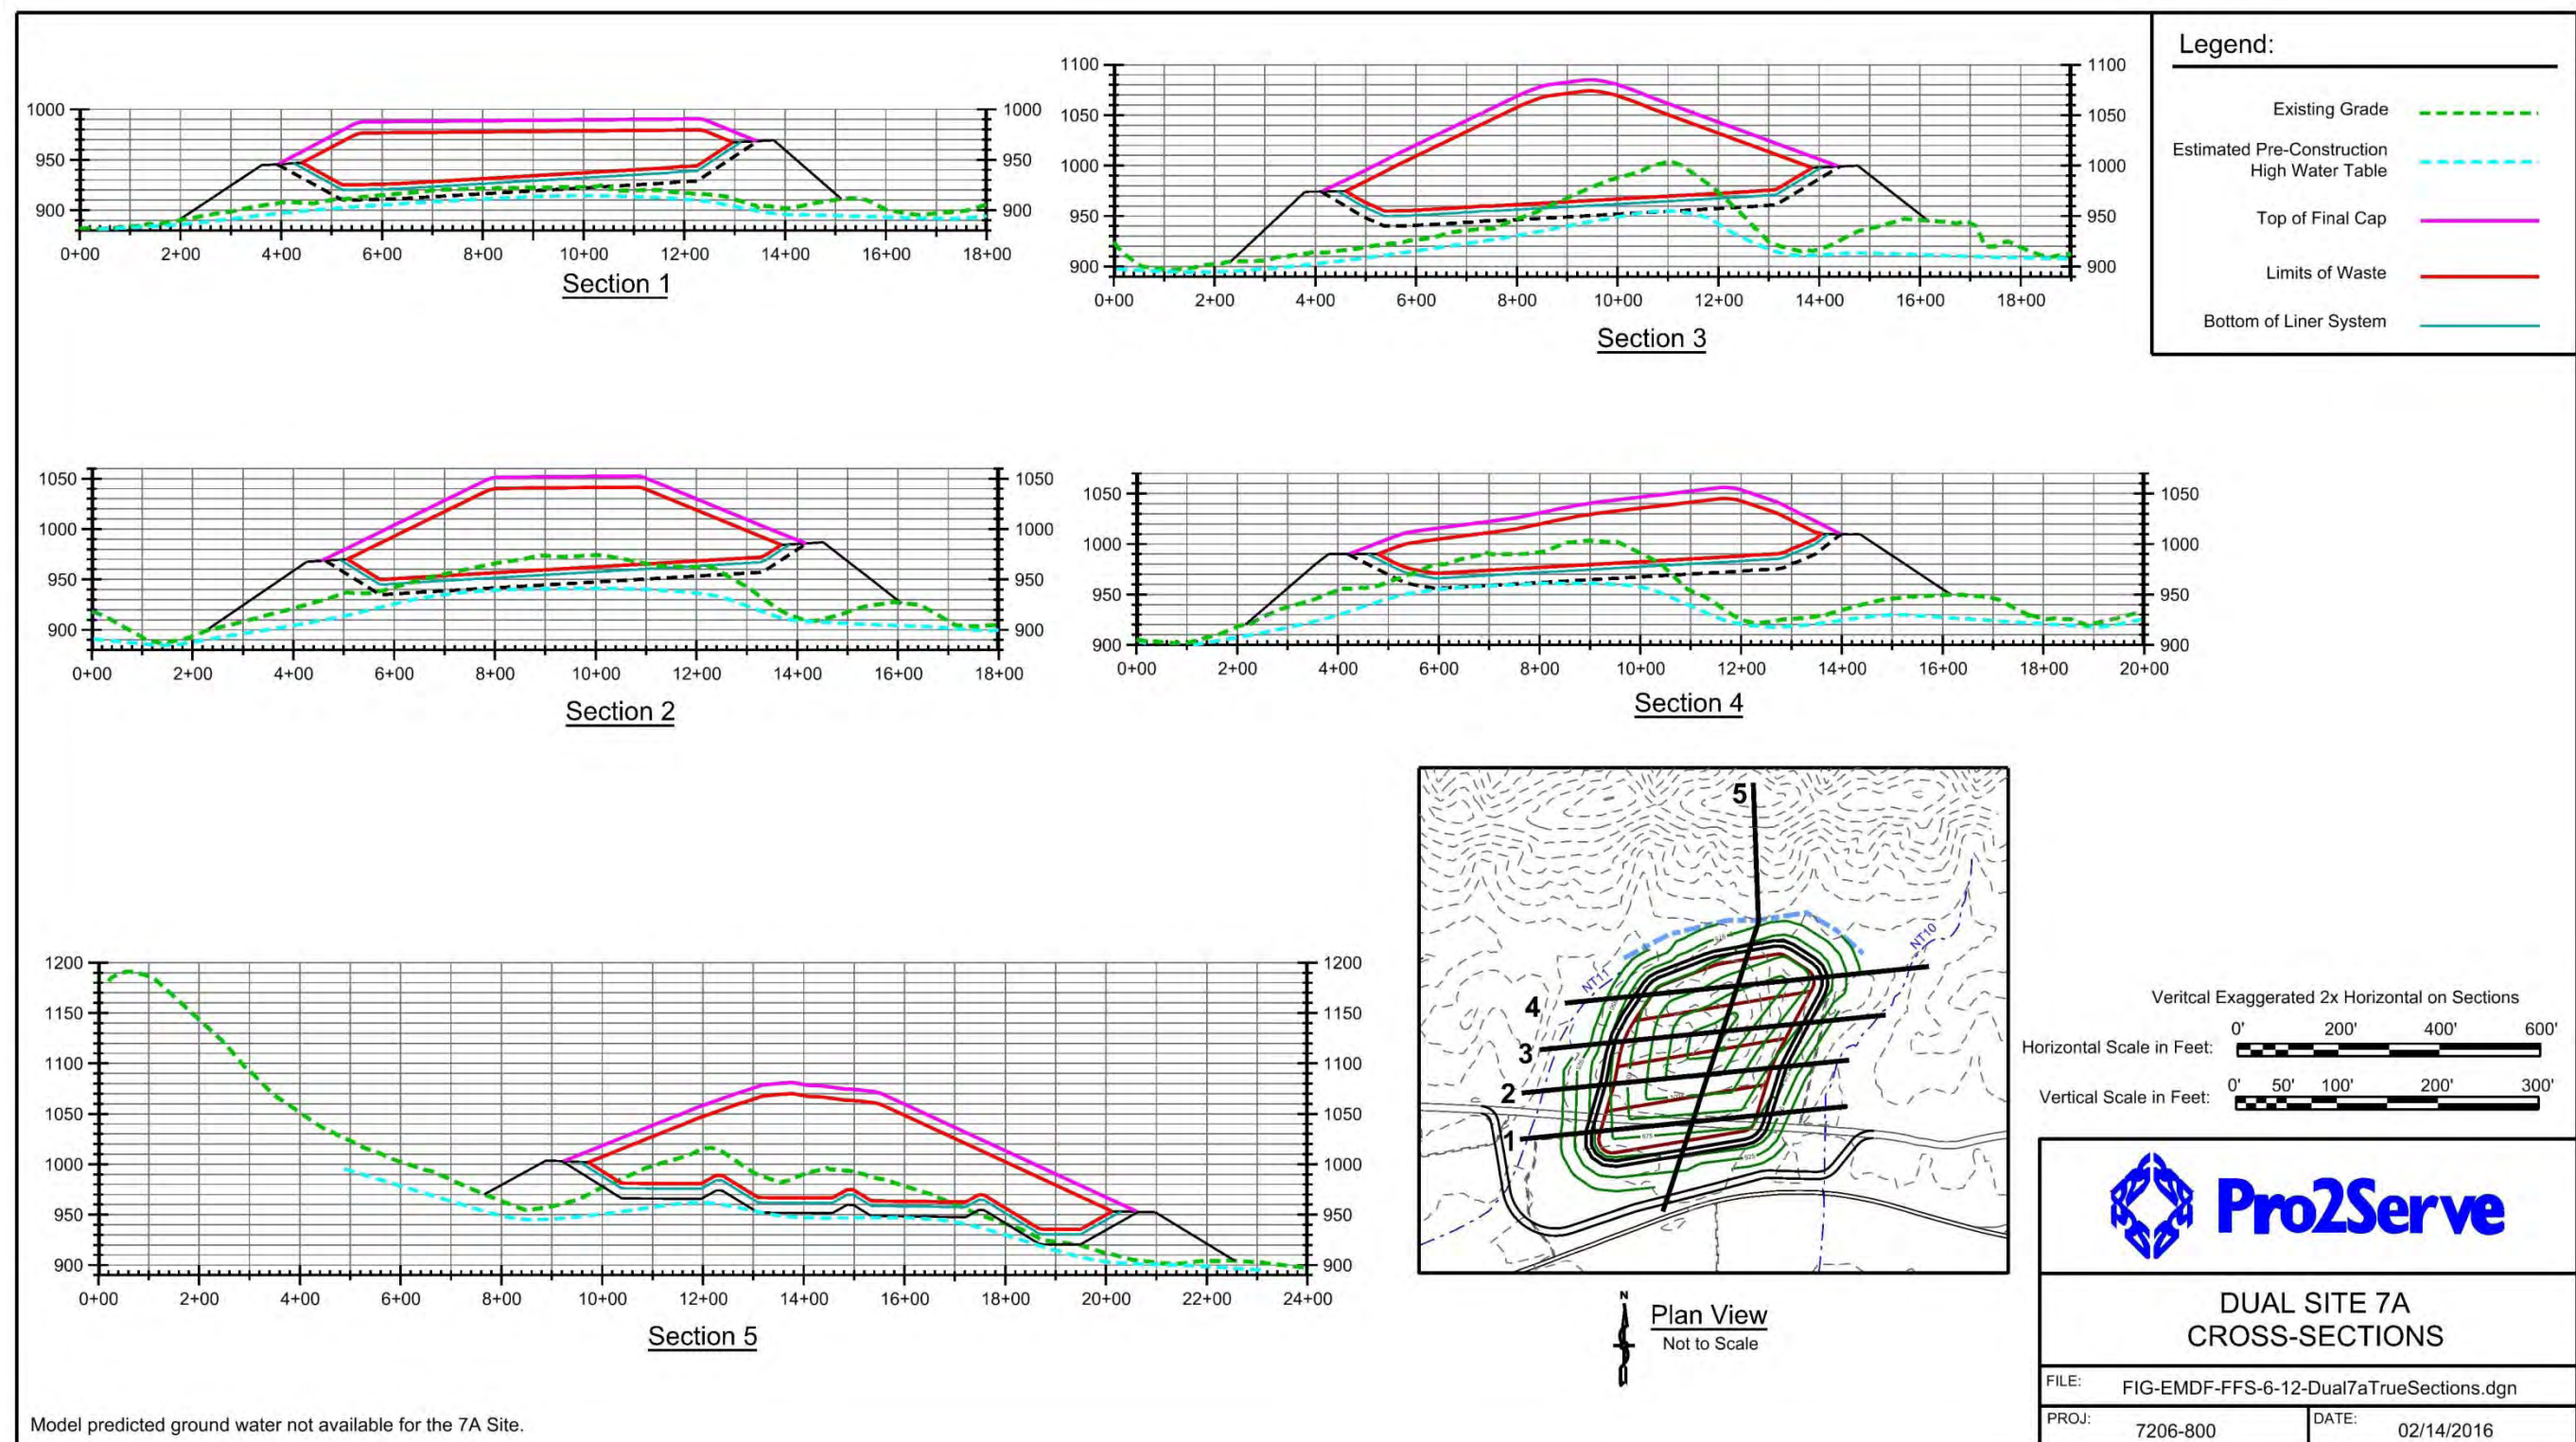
EMDF Cross-sections for Dual Site (7a)
